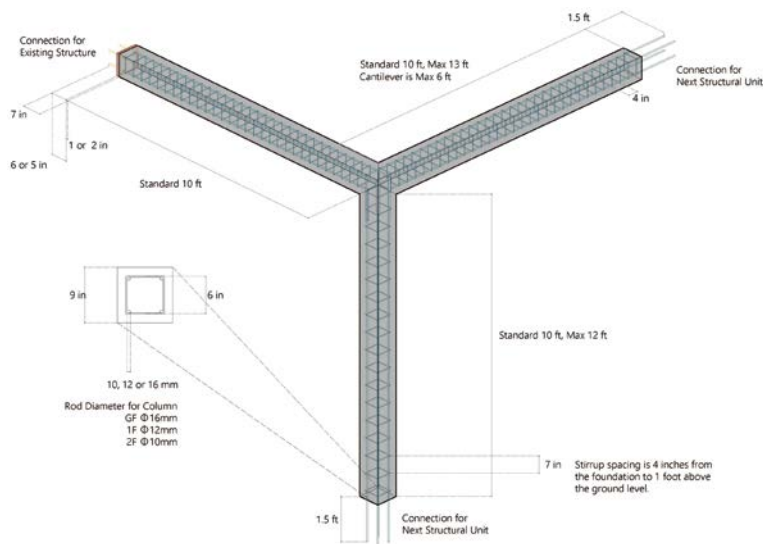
Basic Rules for Beam, Column and Beam-to-Column Connections
